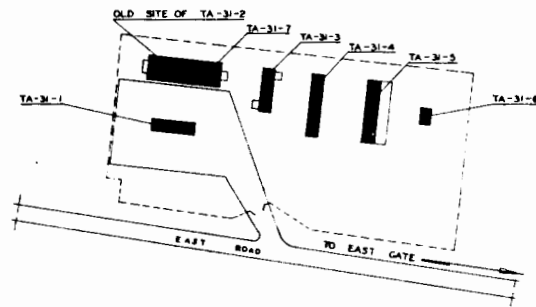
Structure Location Plan for TA-31 - East Receiving Yard (1983 Drawing from the LANL Technical Area Structure Location Plans)
